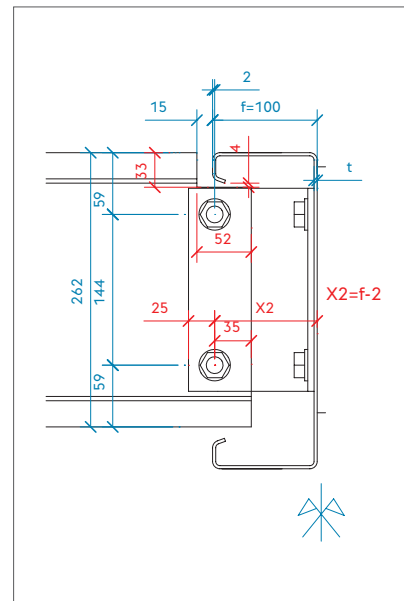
Example of a connection of a floor beam made of 262C+15 to a girder made of 302C+25
